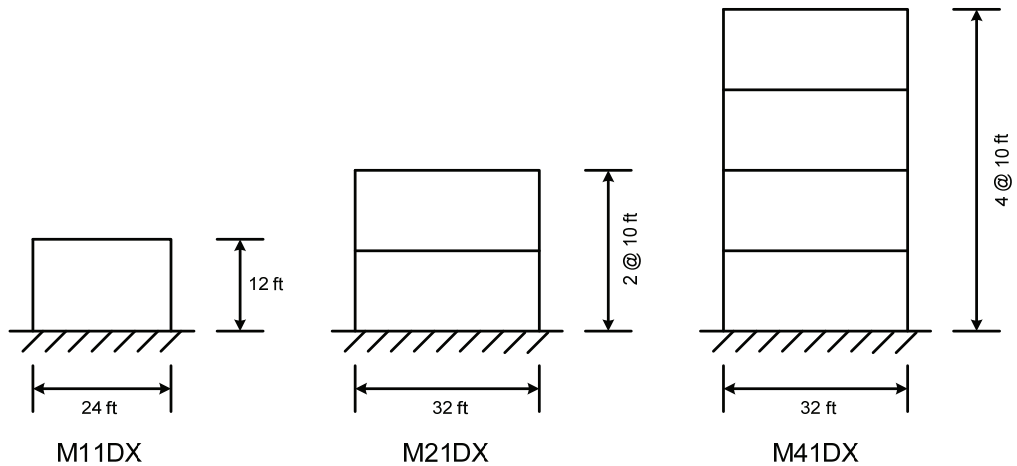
Dimensions of the special reinforced concrete masonry shear wall system.
